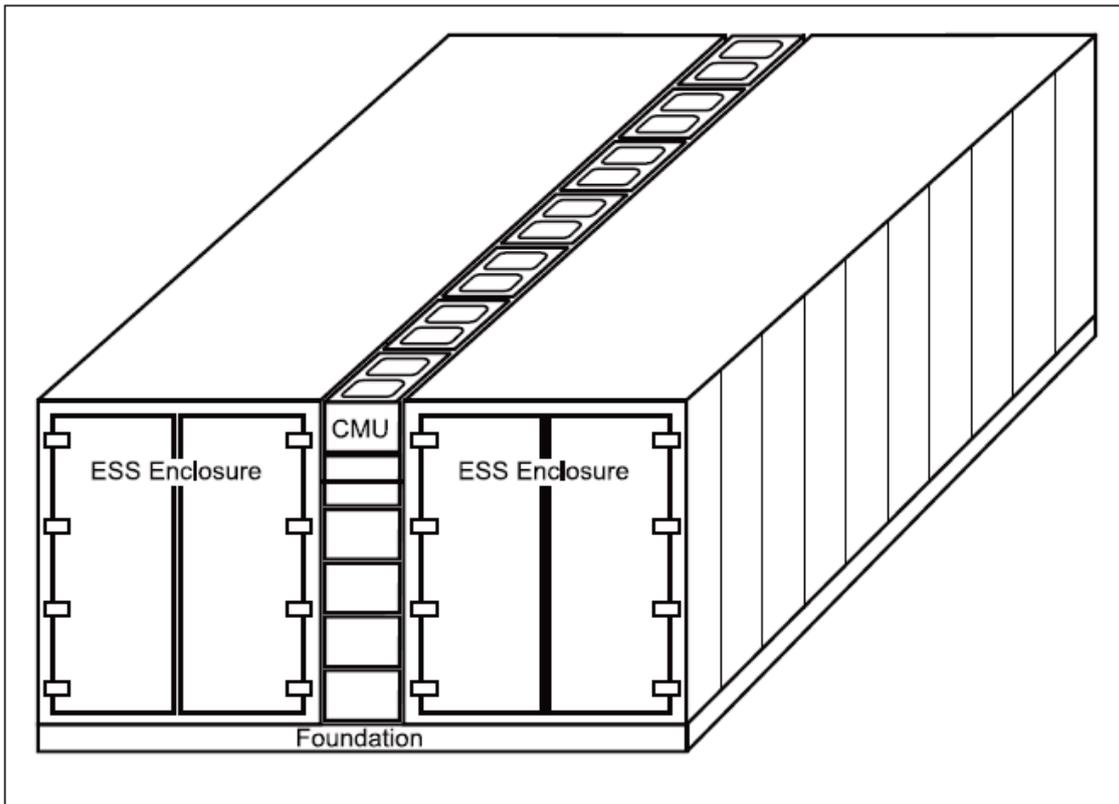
Exterior ESS enclosures with fire barrier
